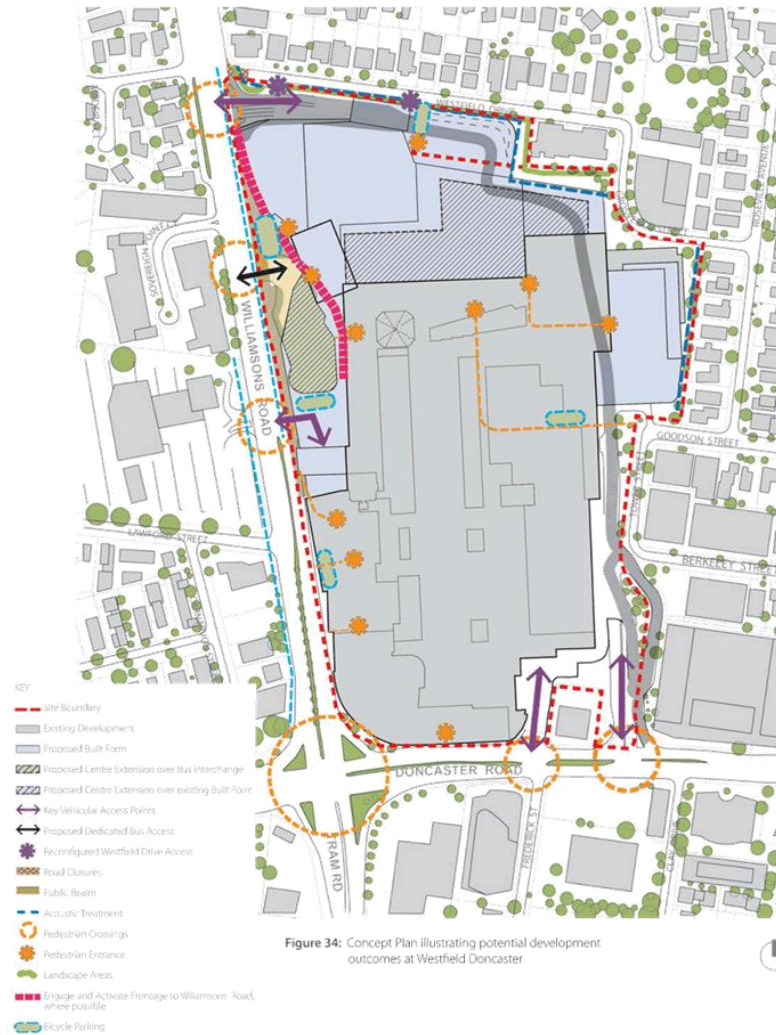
Concept Plan illustrating potential development outcomes at Westfield Doncaster
